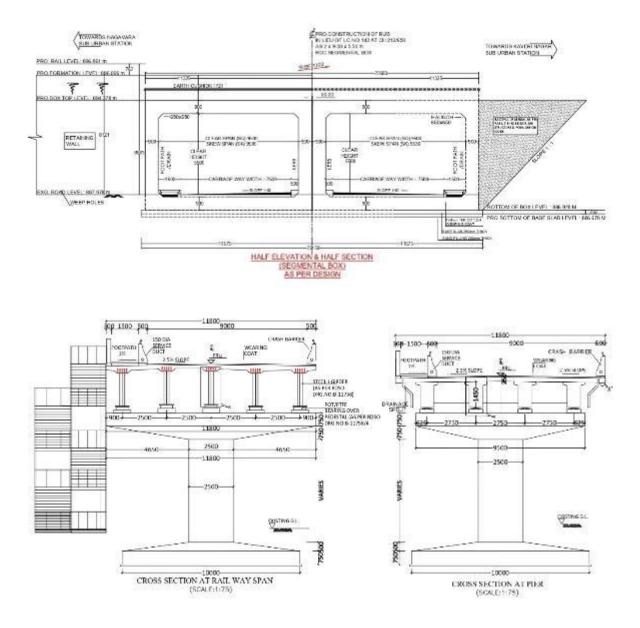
Typical Cross Section of RUB & ROB Proposed in BSRP
